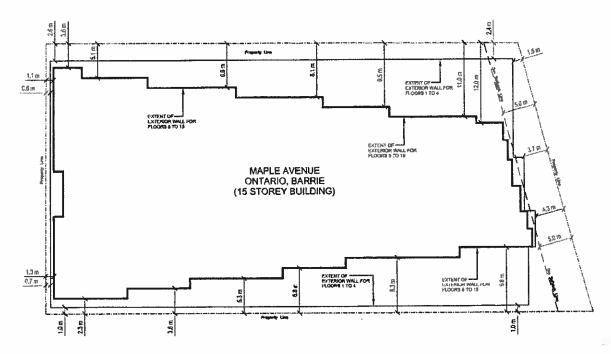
Exterior wall setbacks for building at 15 Maple Avenue, designed to allow additional sunlight and views for neighbouring property at 6 Bayfield Street.
